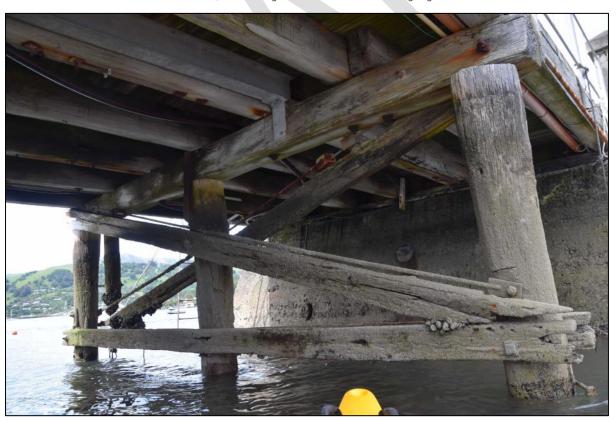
The first bent and the stringer/deck connection to the abutment. This part of the structure contains many original elements, including the pile cap, central pile with wrought iron strap connection to the cap, bracing timbers and horizontal wale between the piles, and timber stringers between the pile cap and modern decking boards.
